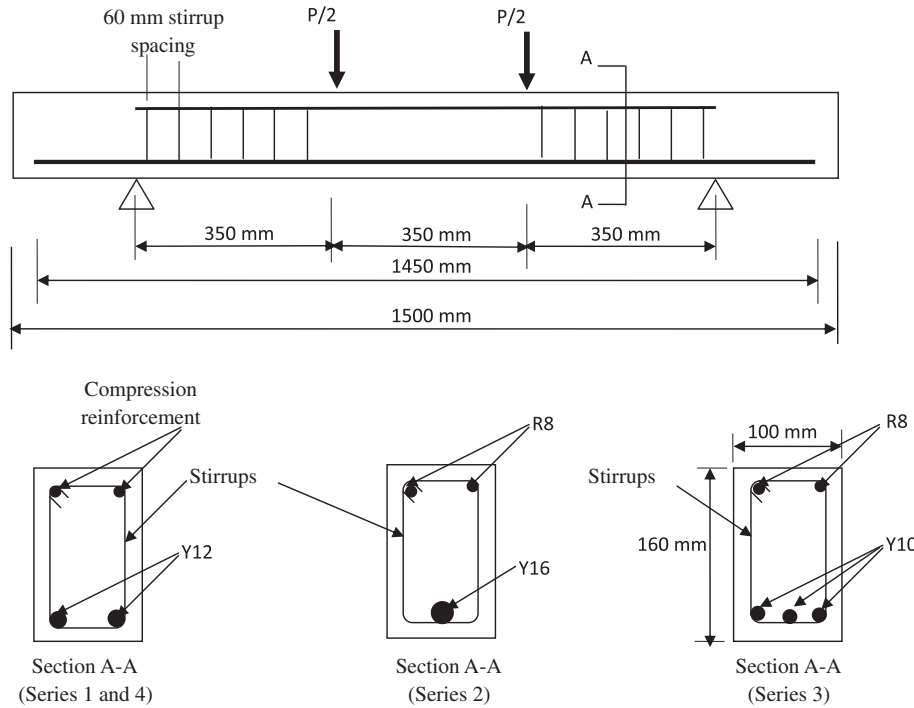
Dimensions and reinforcement details of the concrete test beams.
